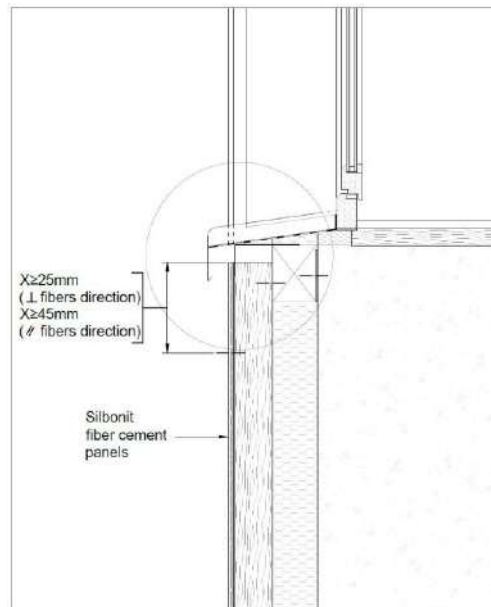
Example of vertical section of a ventilated facade along a window. Wooden subframe.
